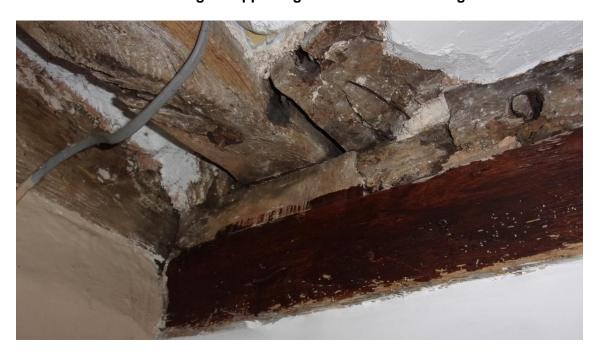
Bearing onto Wall between Dining Room and Study
